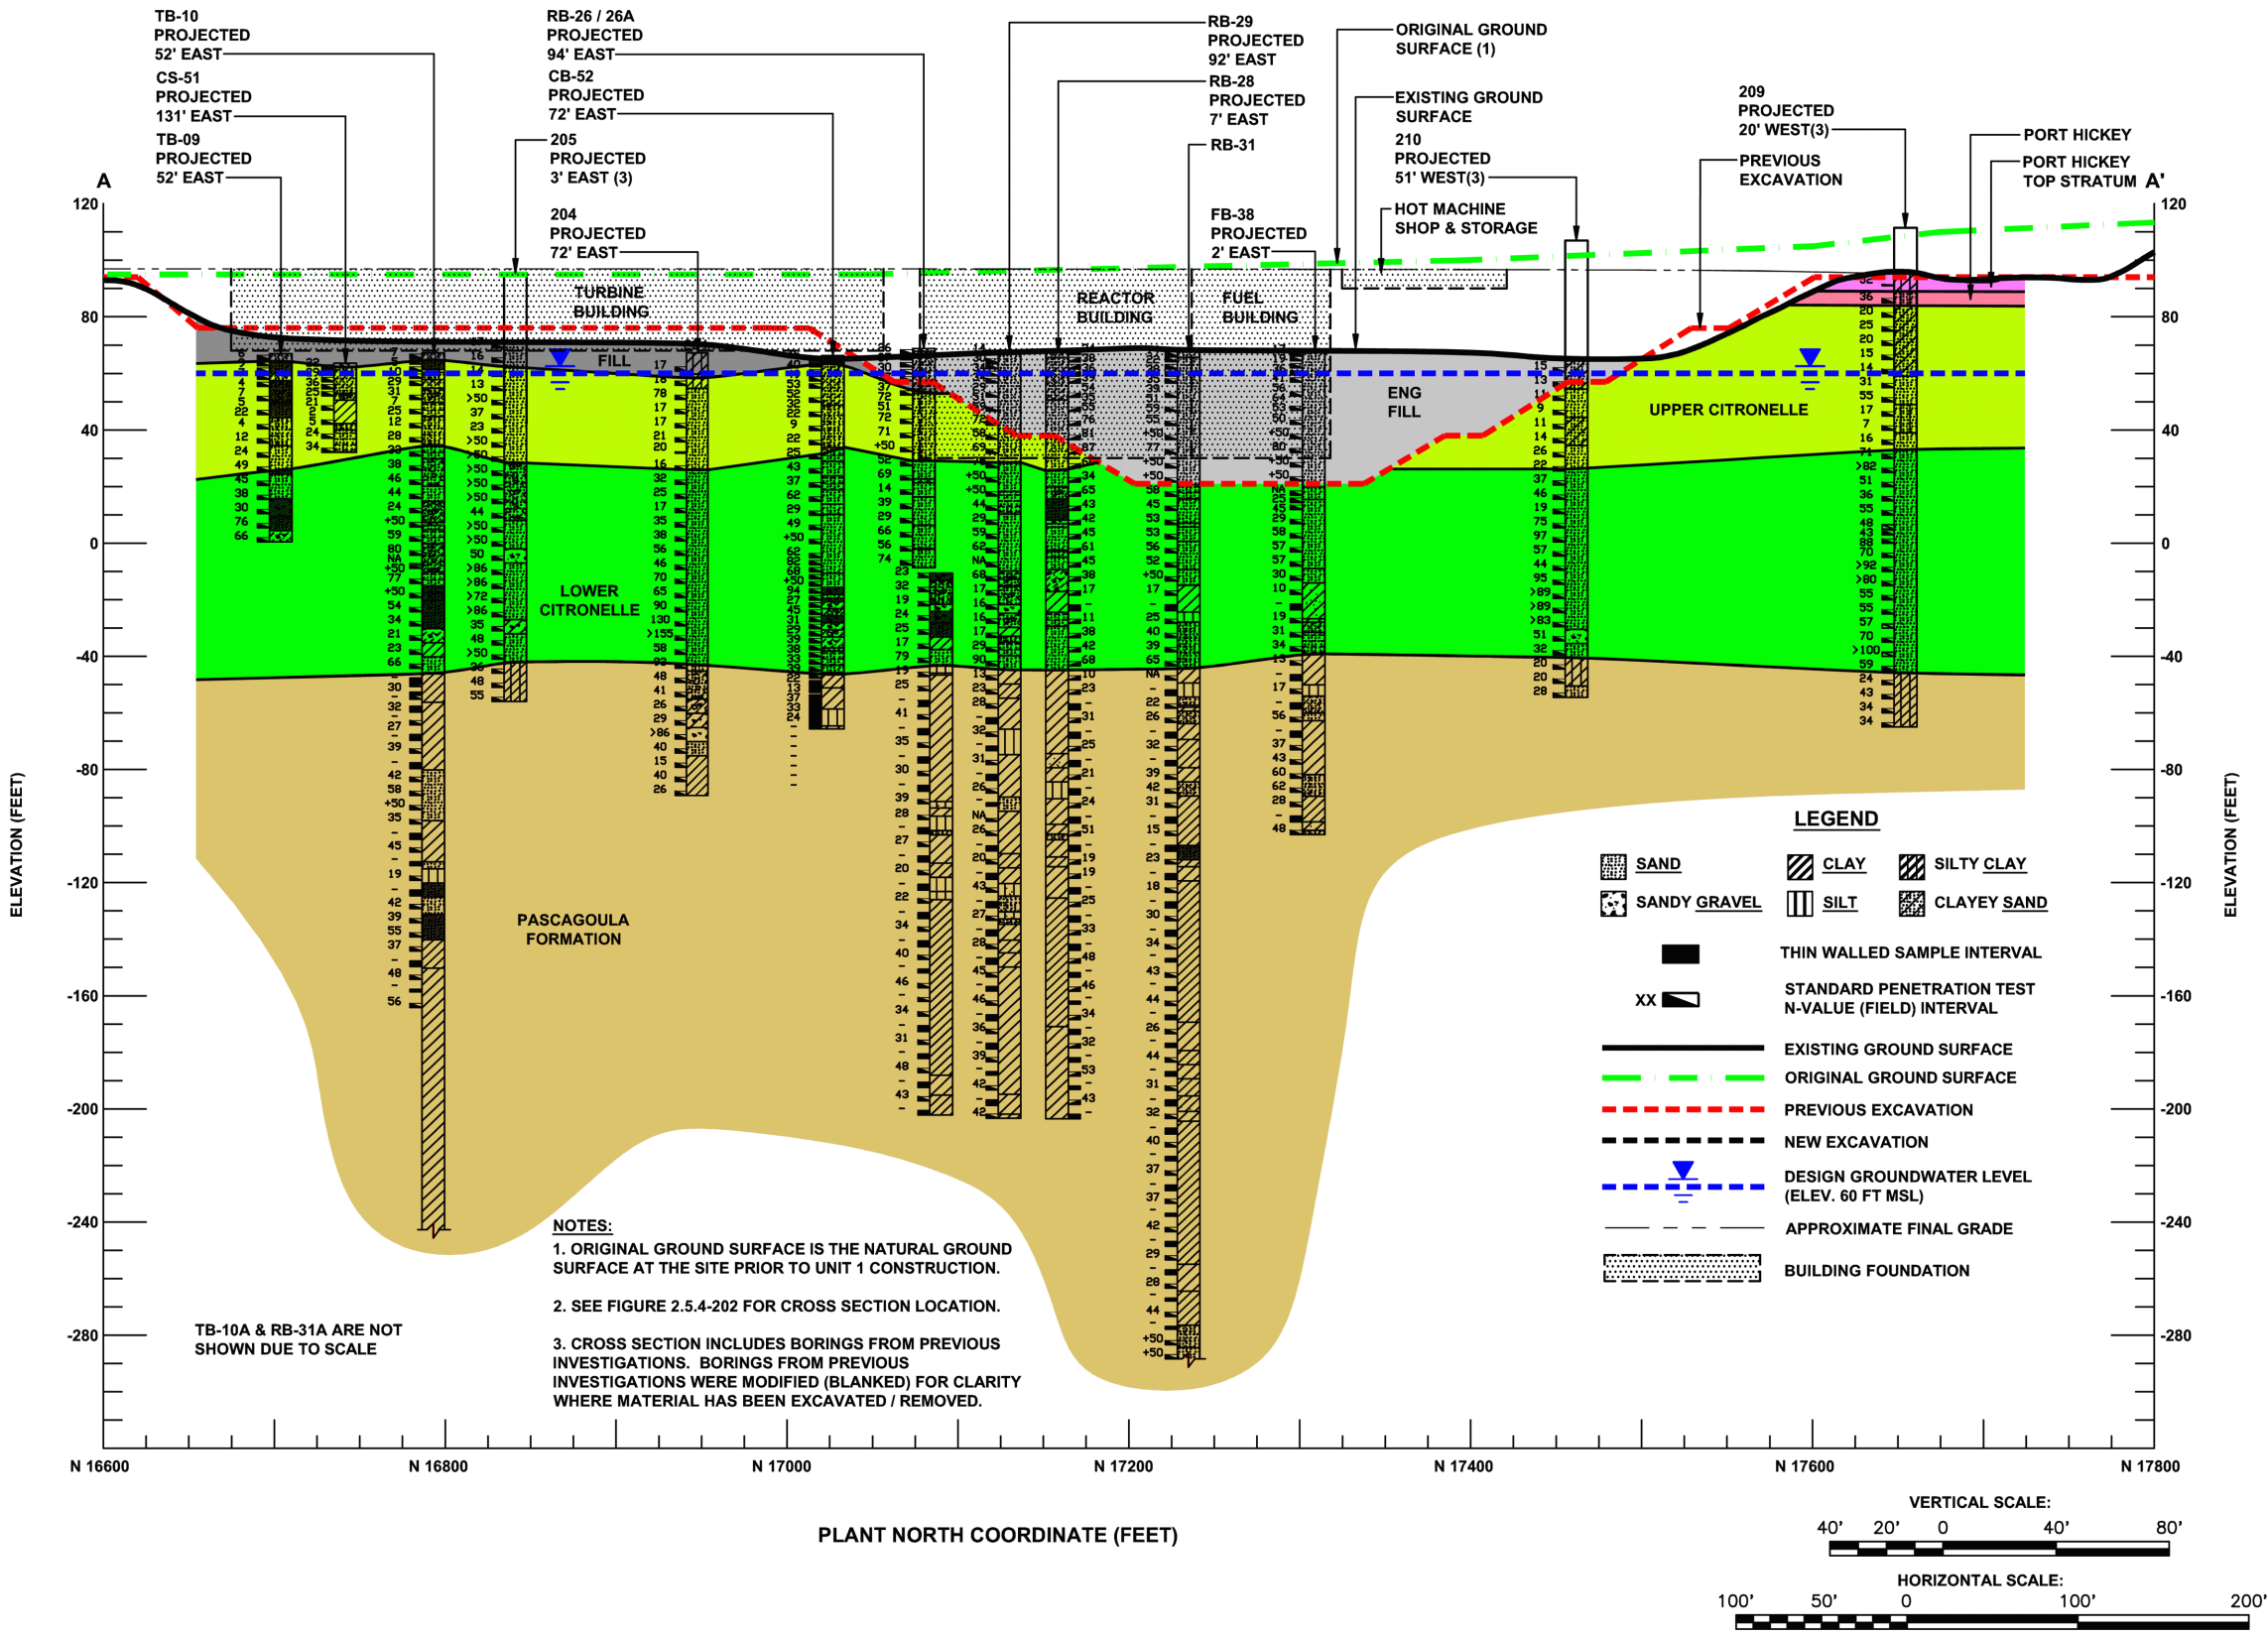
Cross Section A-A' Through RBS Unit 3 Site Location
